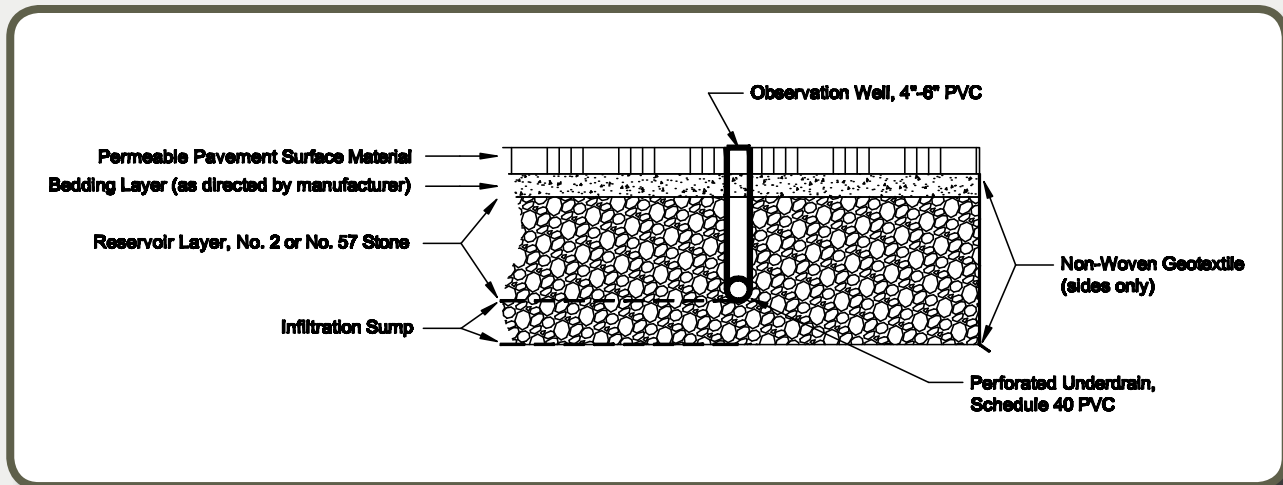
Cross Section of Level 2 Permeable Pavement Design with Infiltration Sump
